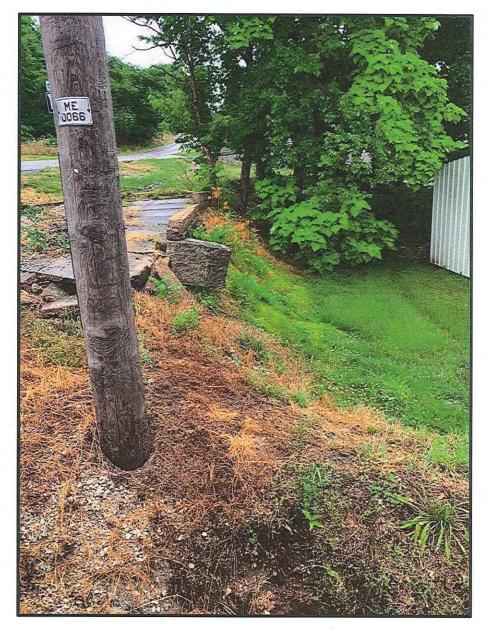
Deteriorated retaining wall along the southeast corner of Third St. and Locust St.
